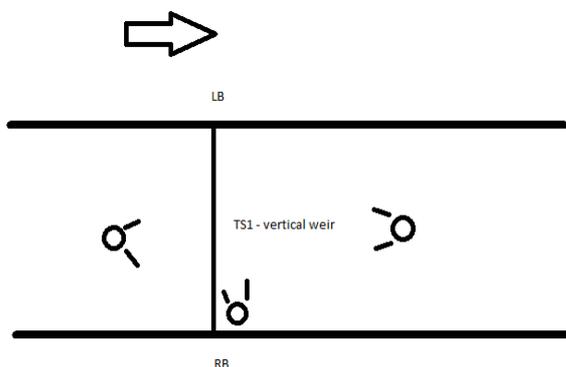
Site plan for Twickenham Barrier 5
